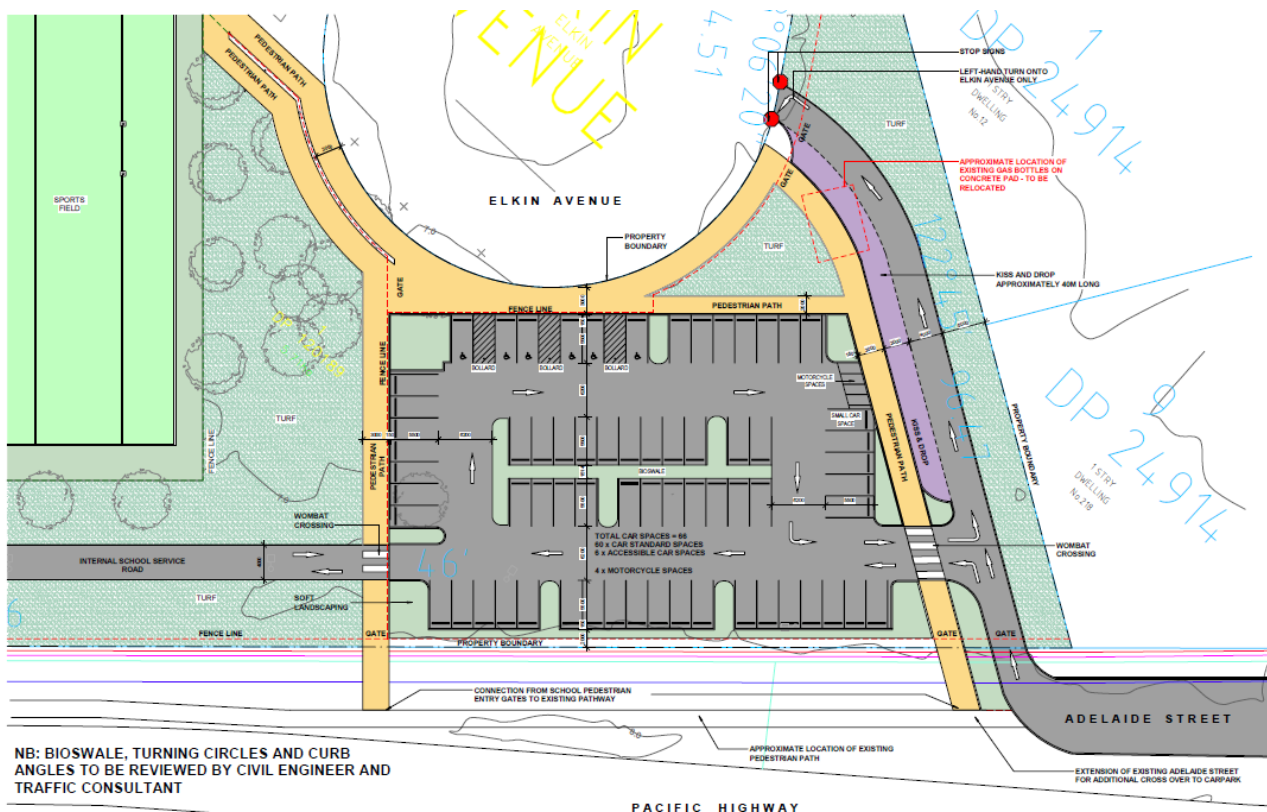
Proposed parking and kiss-and-drop zone near Adelaide Street
